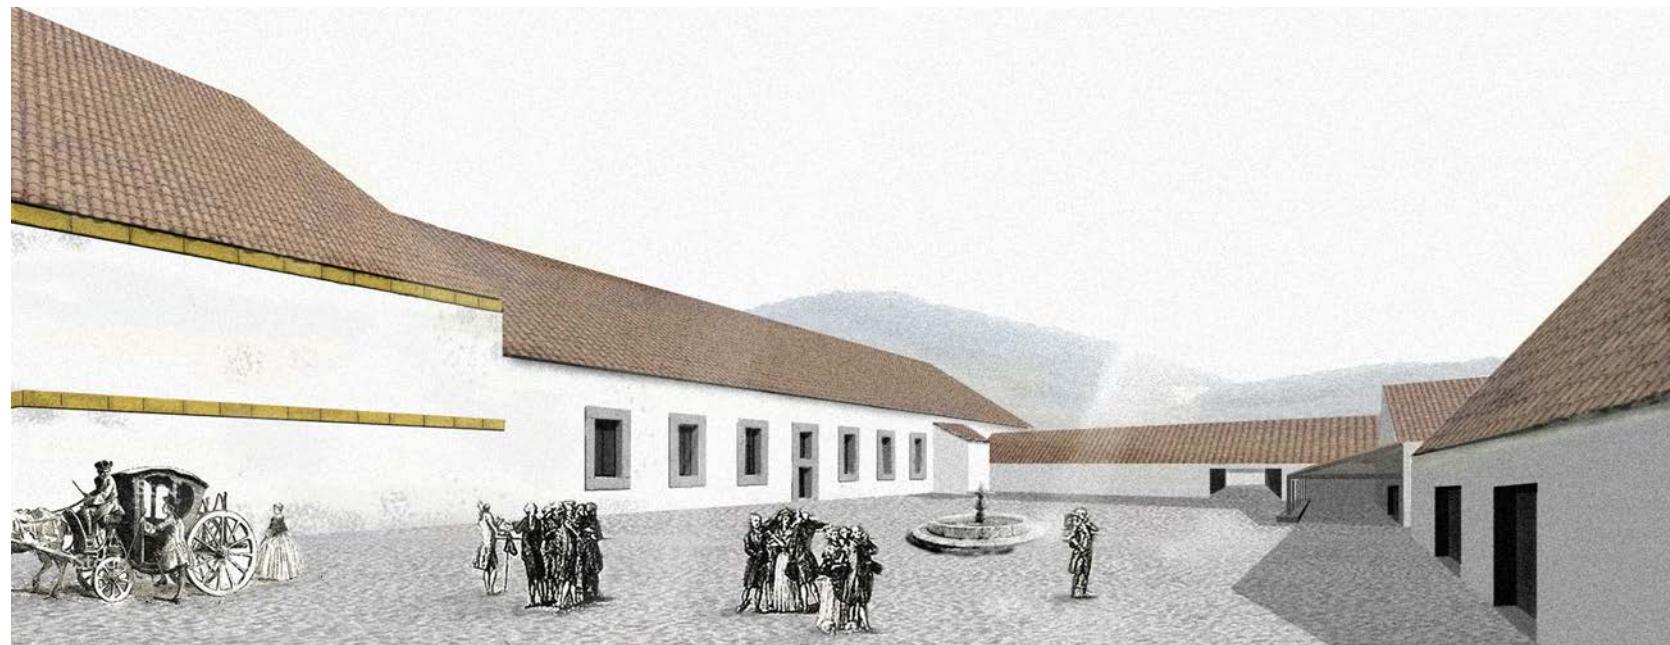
Reconstruction of the cross section of the pen court. Author.
